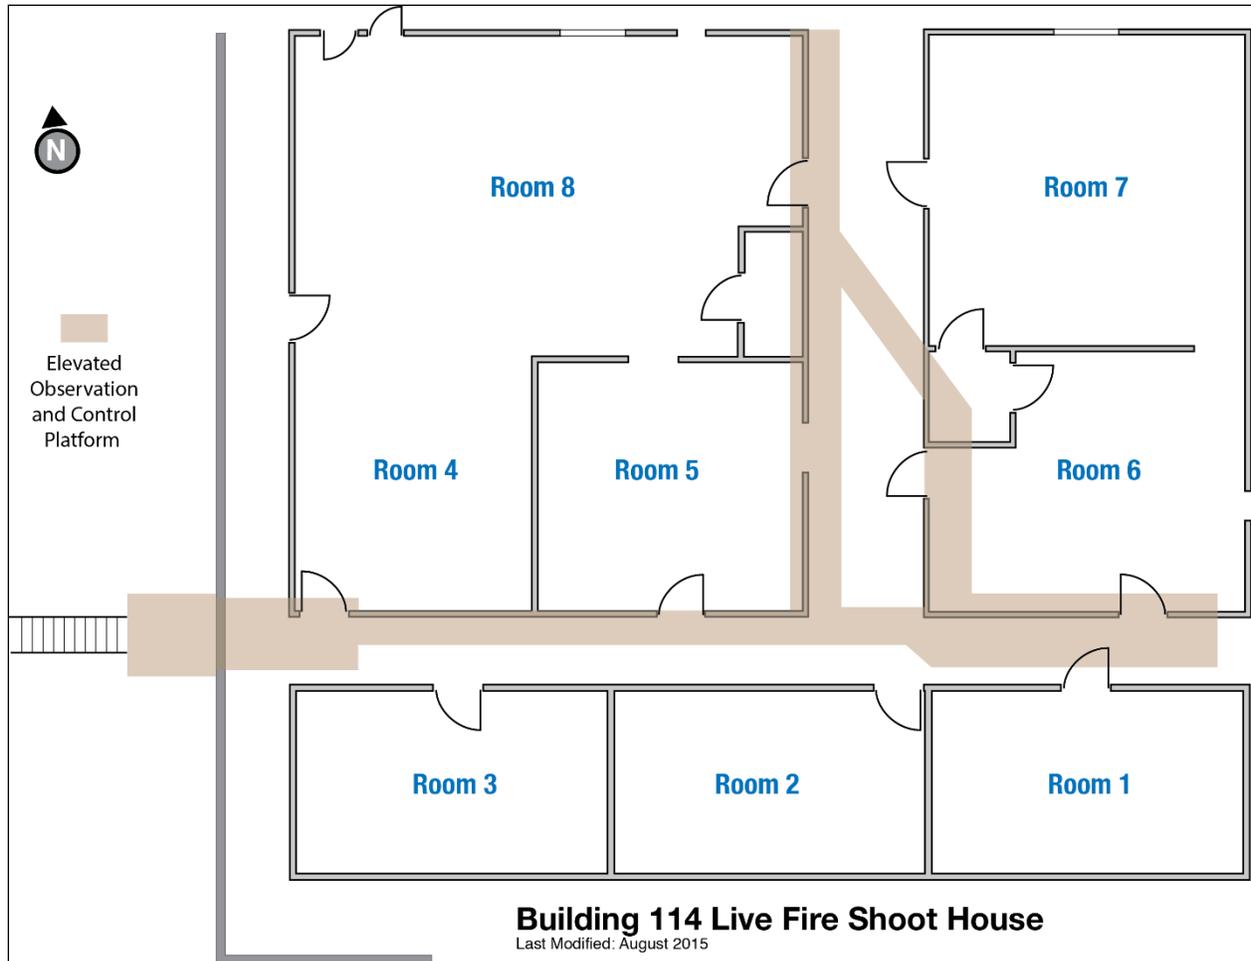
Layout and Features of Building 114 Live Fire Shoot House
